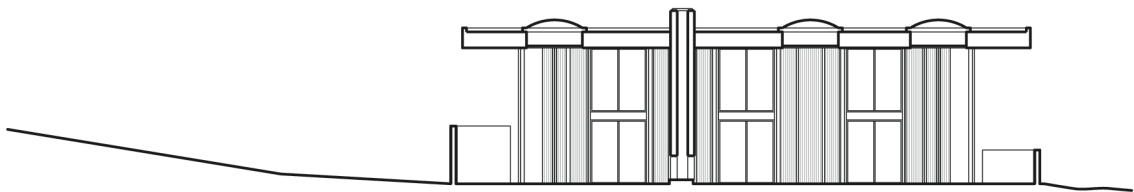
Section H, showing three bays of the public entertaining zone.
